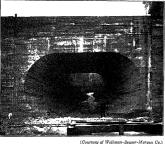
Mouth of draft tube at Cedar Rapids.
